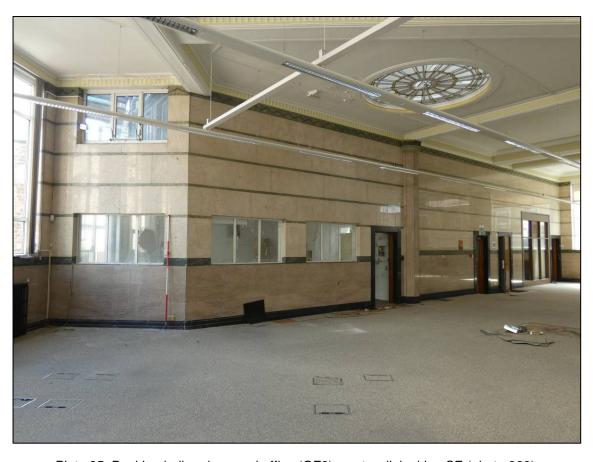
Banking hall and general office (GF2), east wall, looking SE (photo 828).
